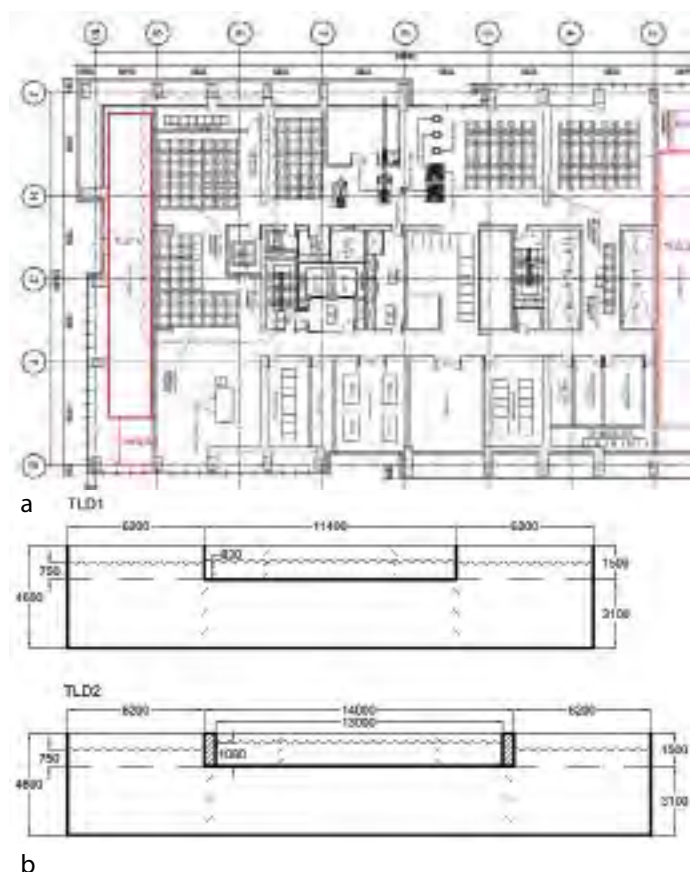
Tuned Liquid Damper Design (Windtech) (a) Layout in Plan (Level 44); (b) Section Views for the two Tuned Liquid Dampers on Level 44.
